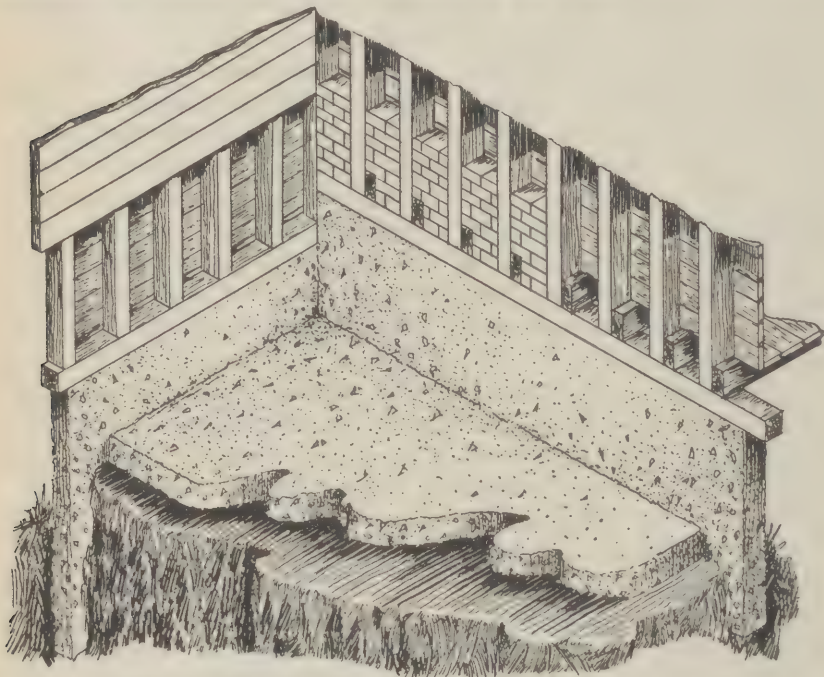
(Schematic). Method of rat proofing building with area wall and concrete floor. Openings between studding closed with brick.
